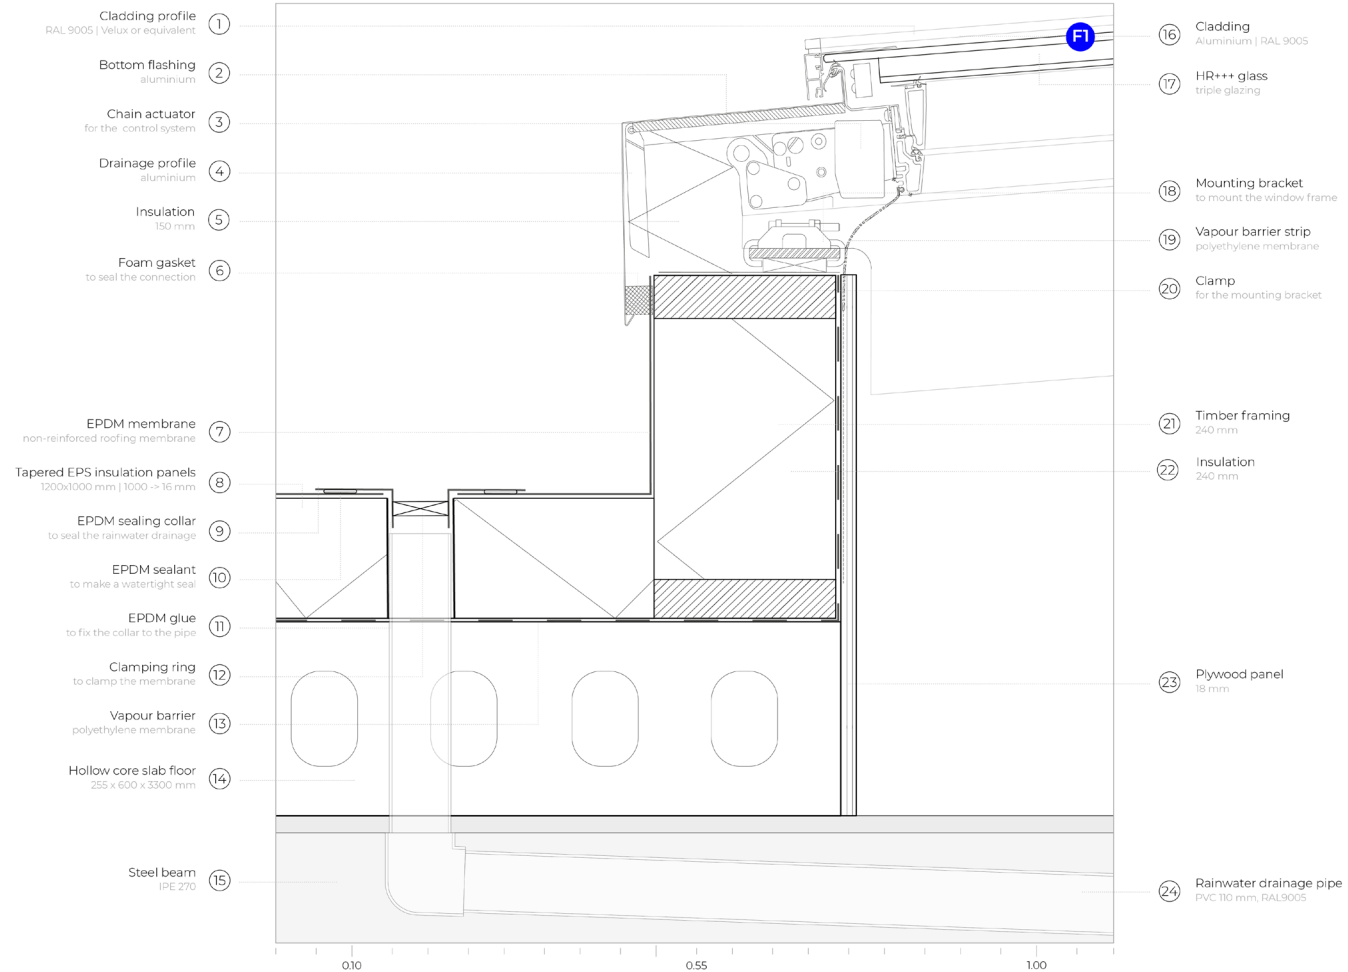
DETAIL DRAWINGS | VERTICAL SECTION E | SCALE 1:10
